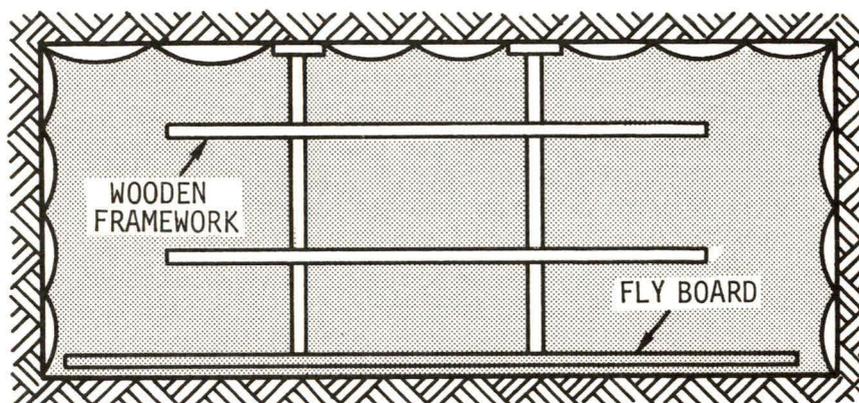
Type C check curtain - curtain nailed to roof board or roof bolt plates with boards at bottom and additional framework.
